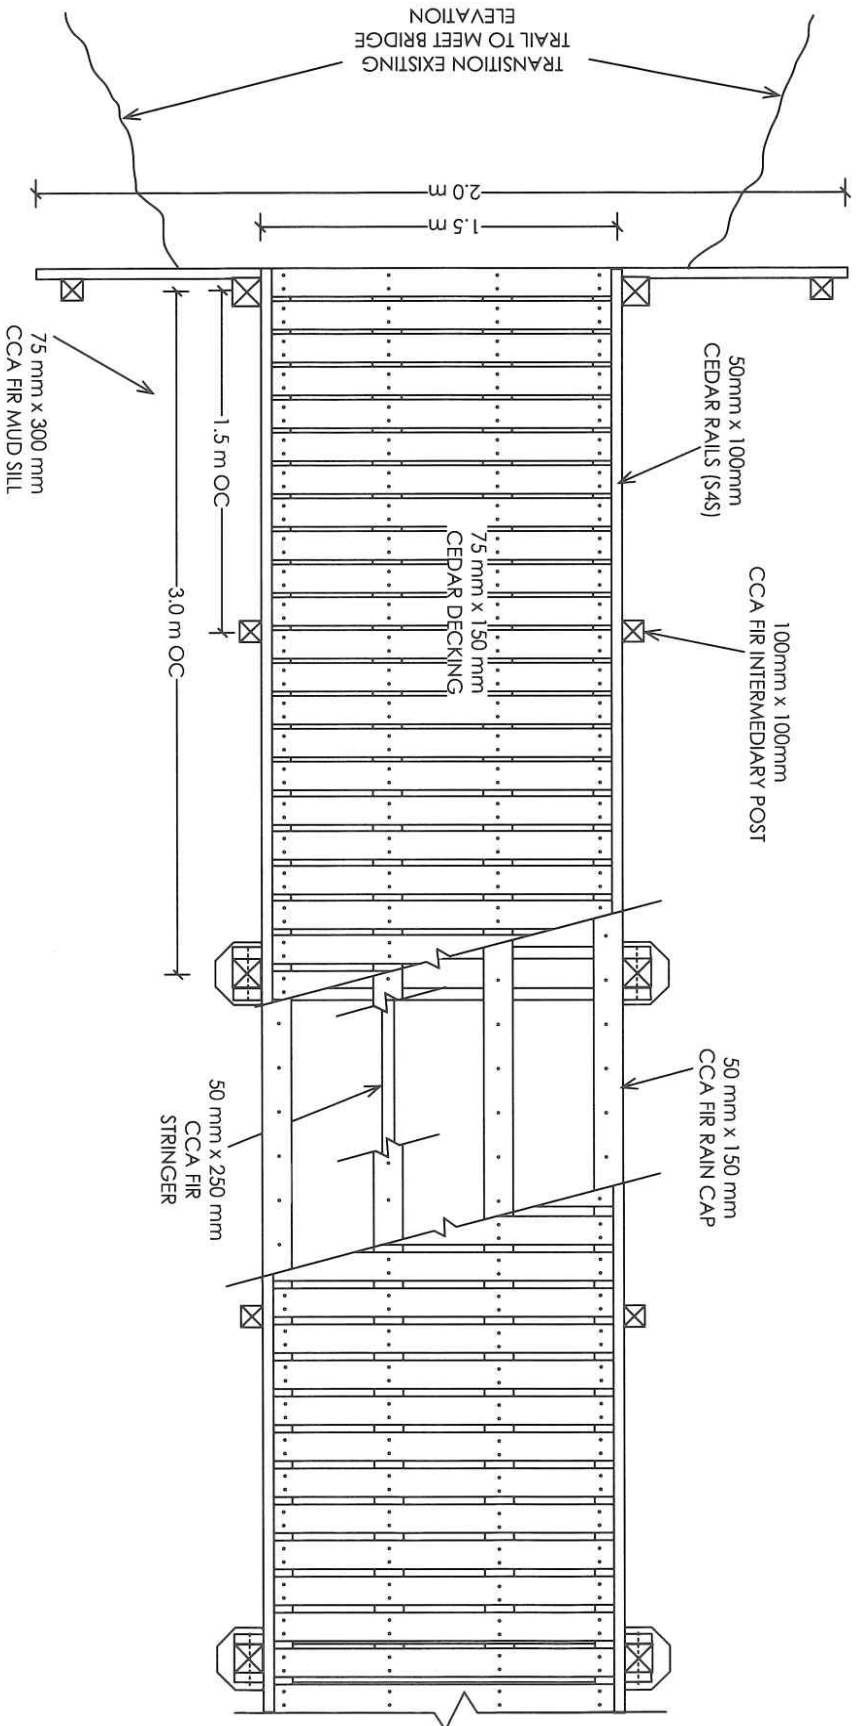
ELEVATED PEDESTRIAN BOARDWALK WITH DIAMOND PIERS (CONT'D)
